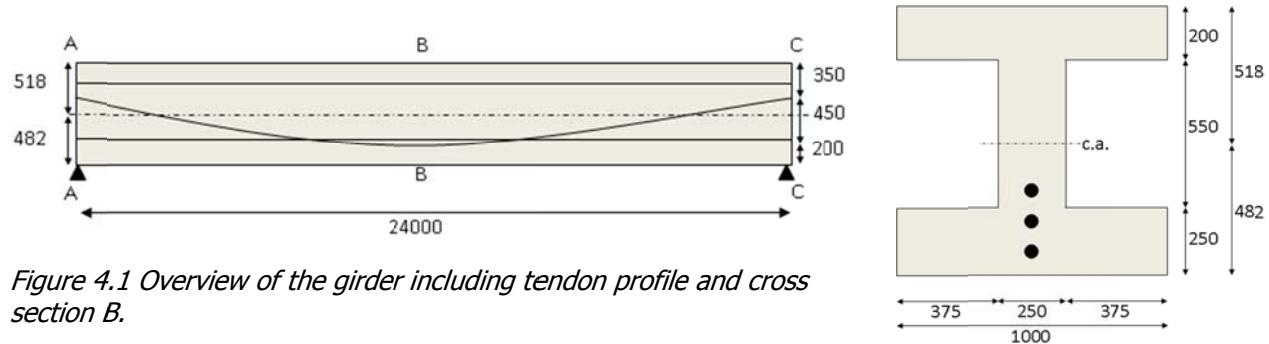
Overview of the girder including tendon profile and cross section B.
